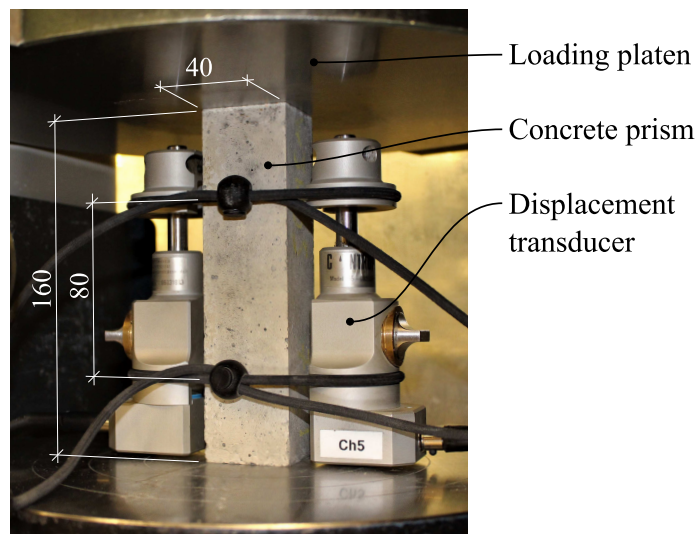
Concrete prism compression test arrangement (dimensions in mm).
